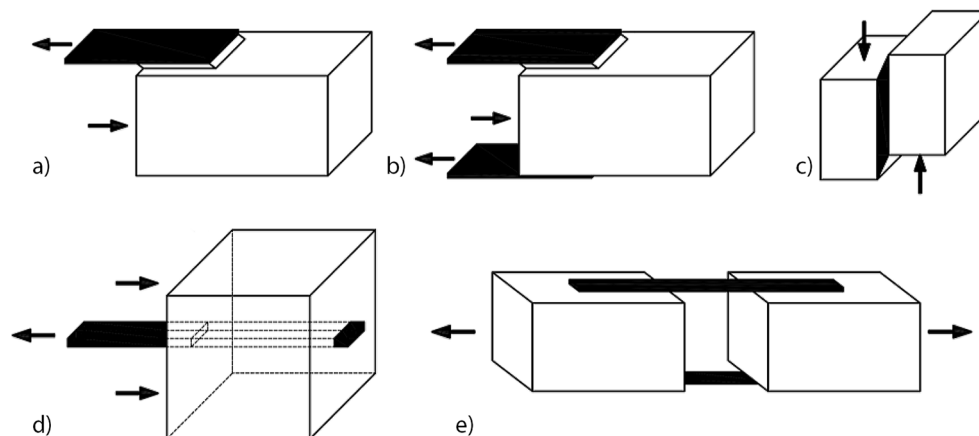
Methods for testing adhesively bonded wood-CFRP connections [2]
